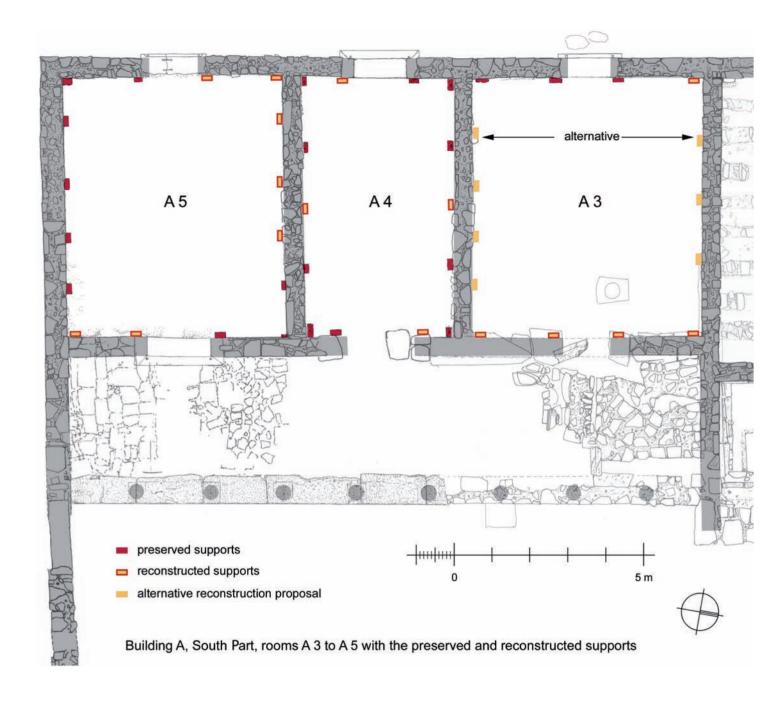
Despotiko, Mandra. South Part A, rooms A 3 to A 5: preserved and reconstructed supports; plan (scale 1:100)
